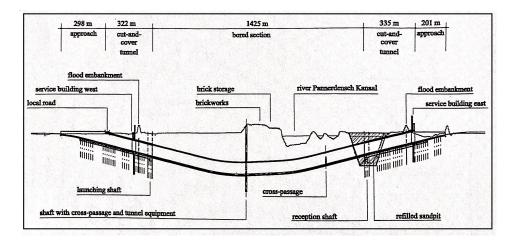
Longitudinal section of railway tunnel(Tunnelling and Underground Space Technology)
